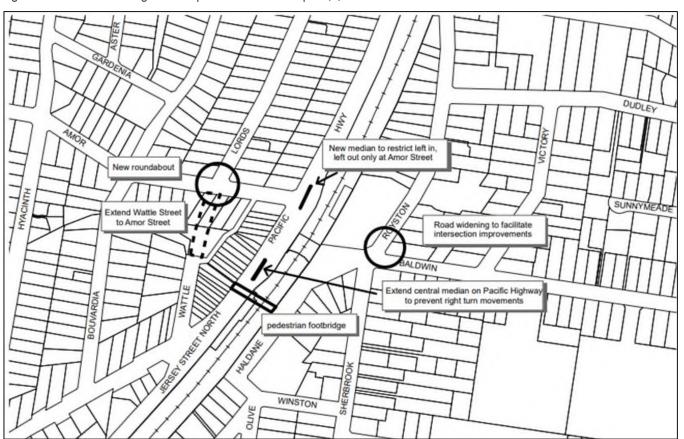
k: Traffic Management Improvement Plan - Asquith (C)
